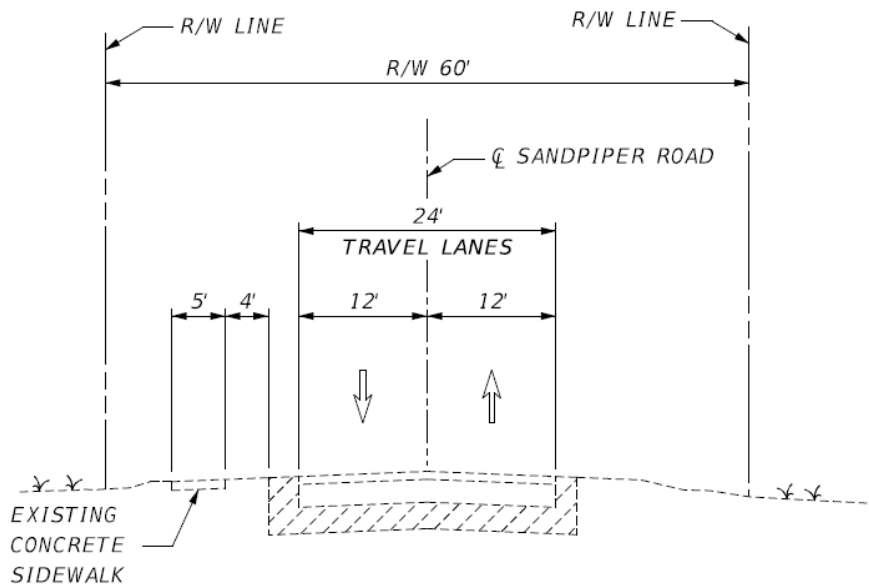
| Existing Typical Section – Sandpiper Street east of Park Avenue
